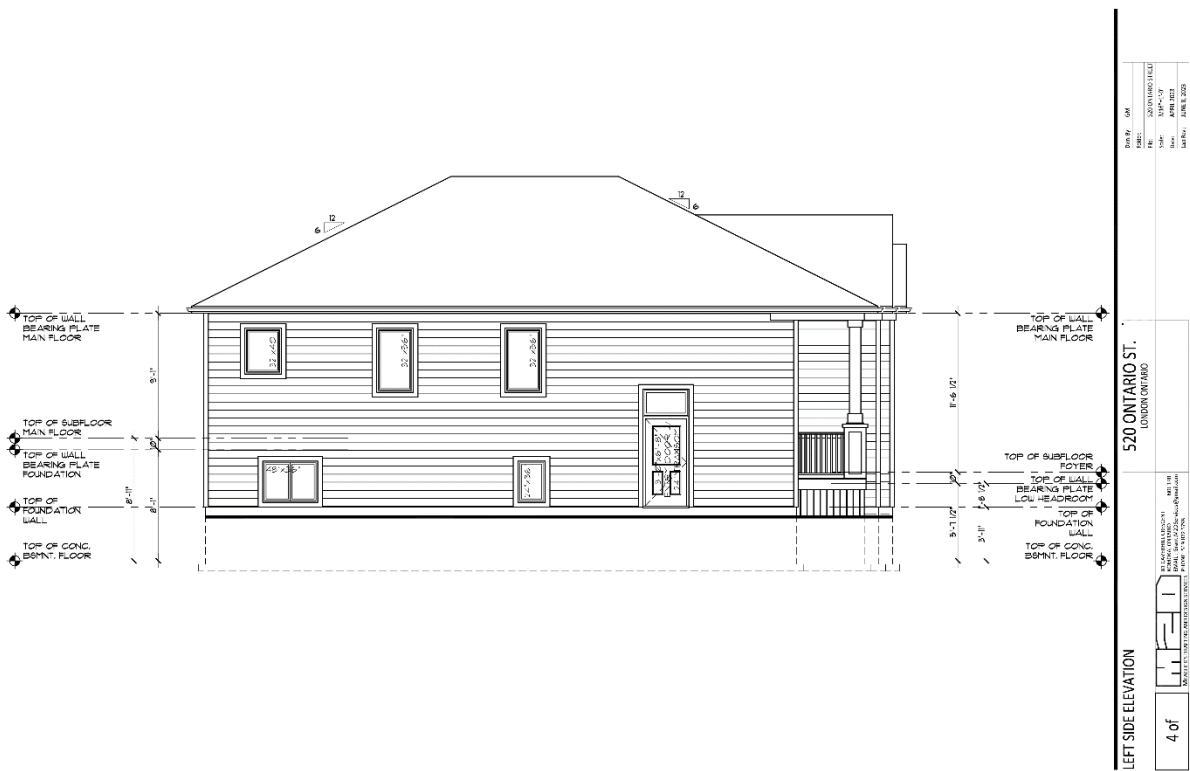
North elevation for proposed house on the subject property at 520 Ontario Street, Meaghers Drafting and Design Services, dated June 2023.
